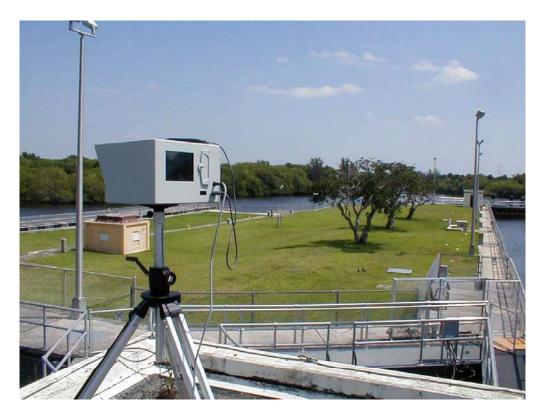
Optech ILRIS 3D laser scanner--detailed mapping of structures and facilities at St. Lucie Lock and Dam, Jacksonville District (Arc Surveying & Mapping, Inc.)
